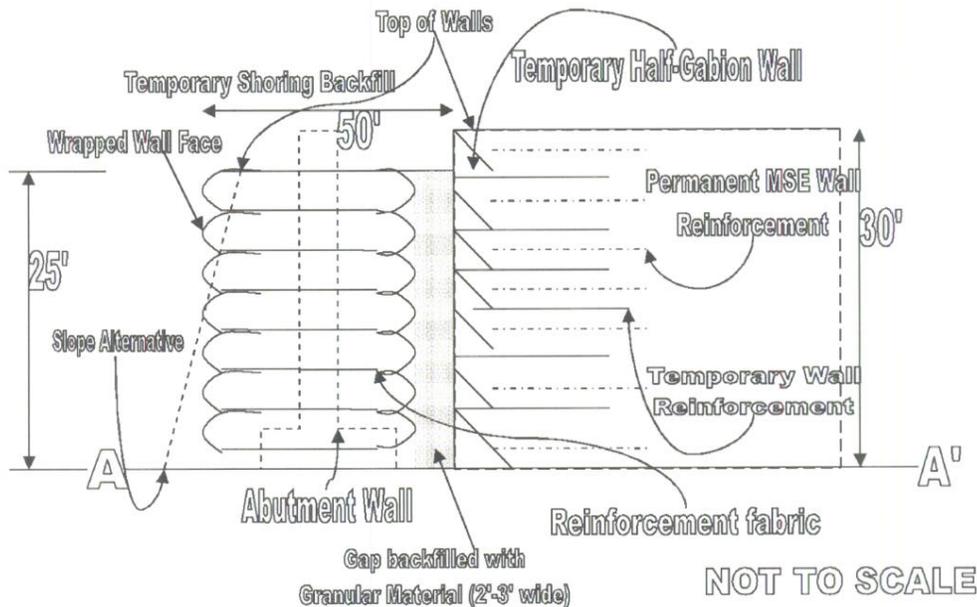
Cross Section (A-A') of Temporary Shoring Backfill
